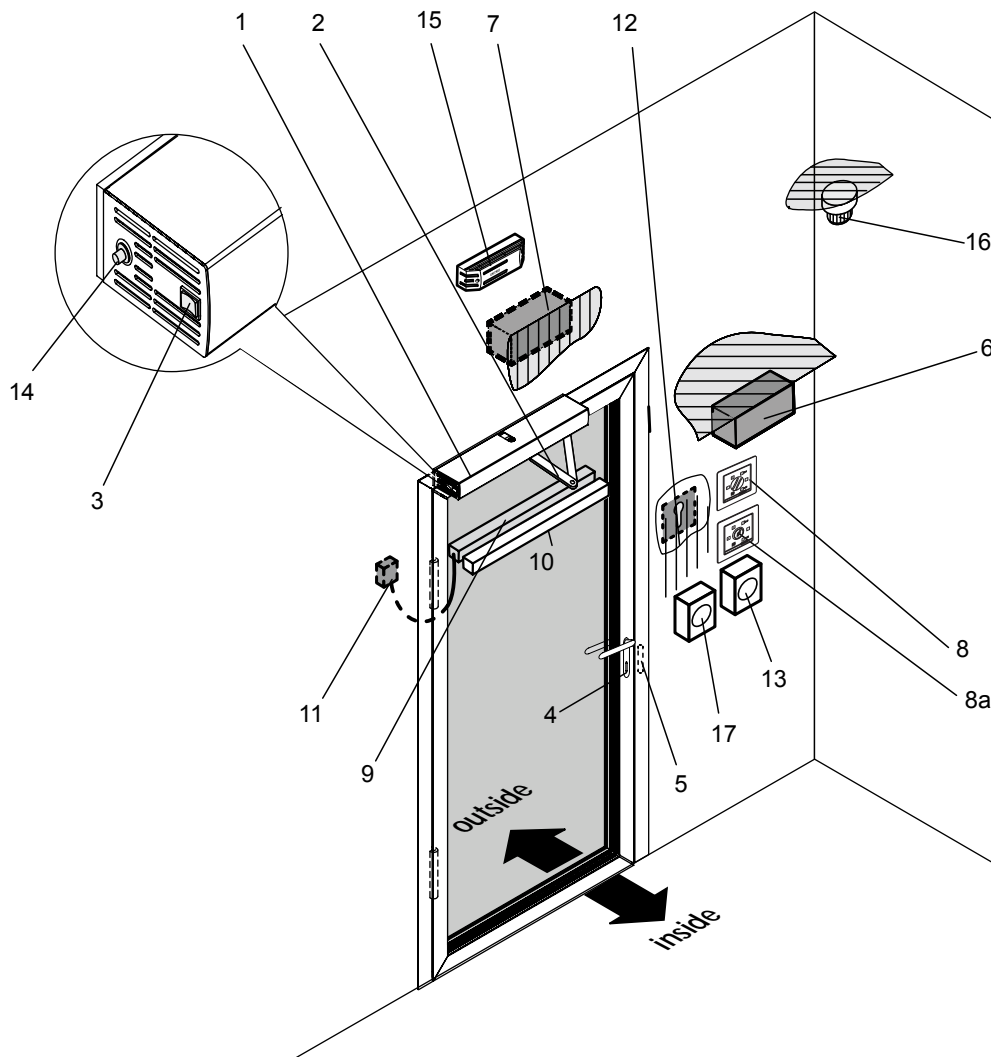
Example: TSA160NT F door drive, 1-leaf, head mounting
